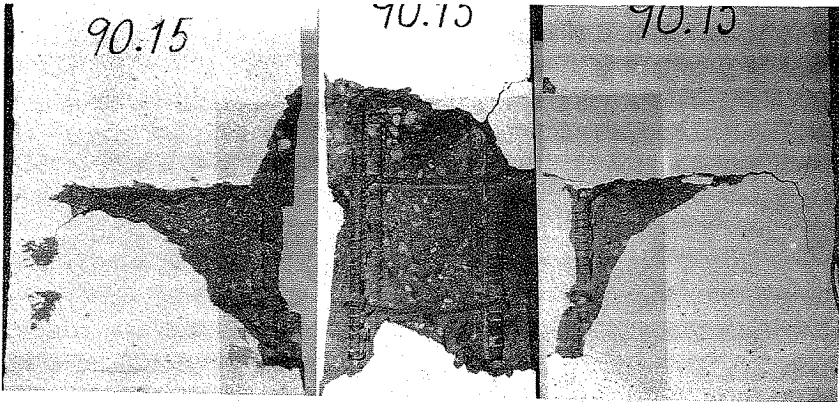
Failure of S.B.-specimen No. 90/15.
